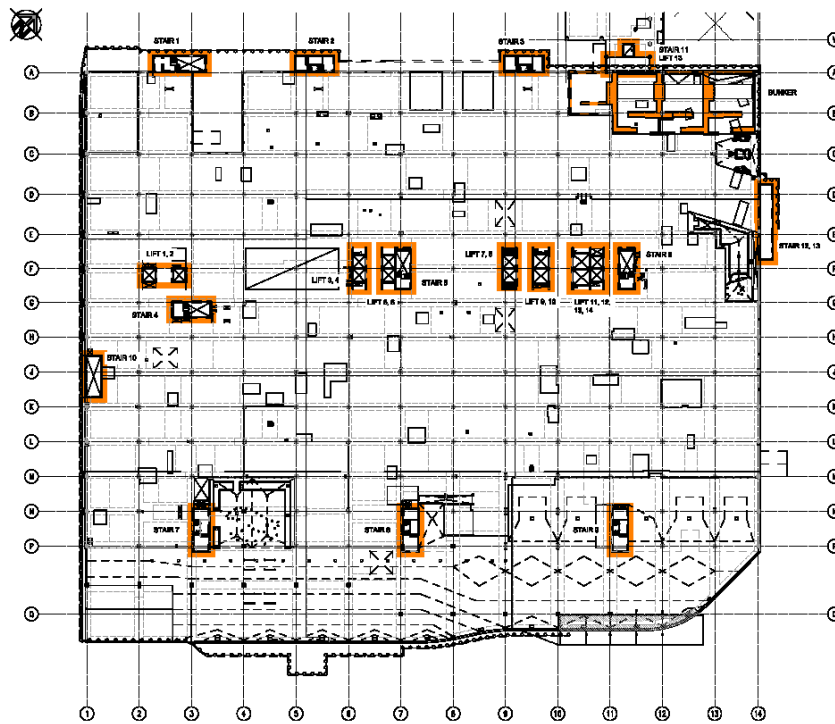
Level 2 floor plan, highlighting major shear walls in the building
